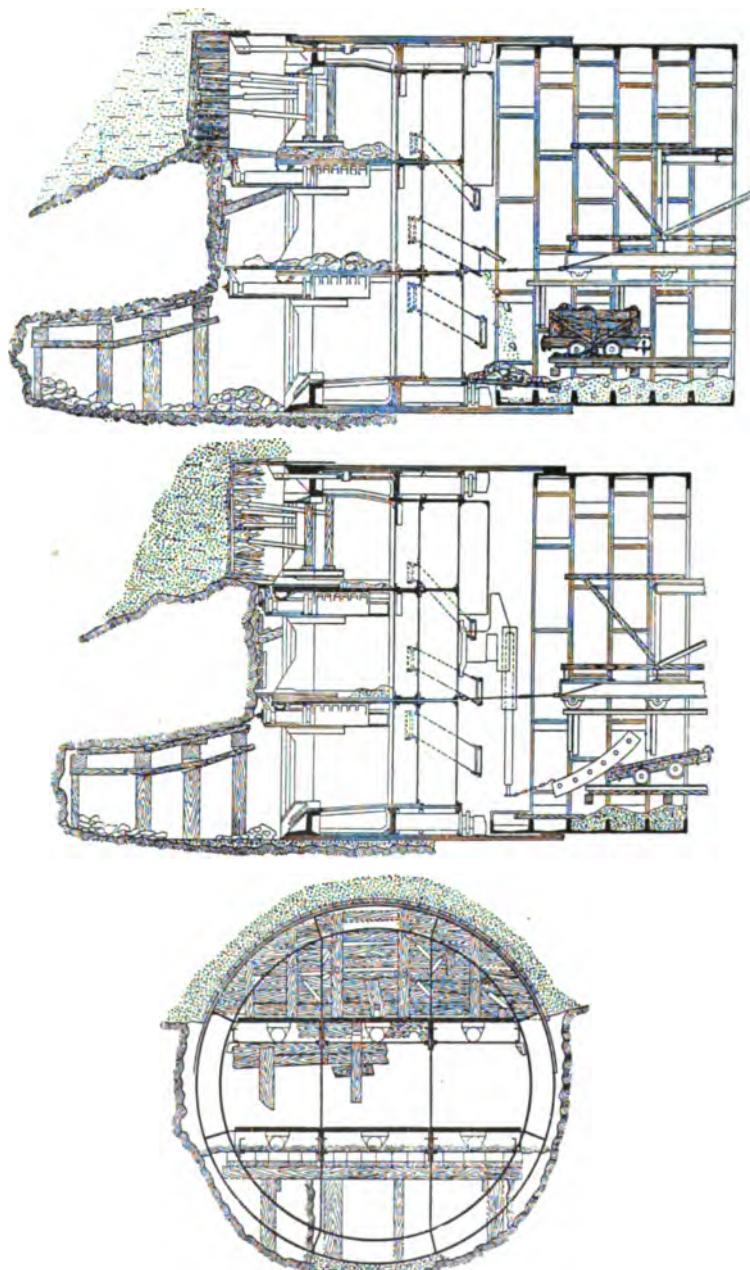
Work in mixed face with sliding hood. Pennsylvania Railroad East River Tunnels (A-19). (From *Trans. Am. Soc. C. E.*, vol. 68.)
